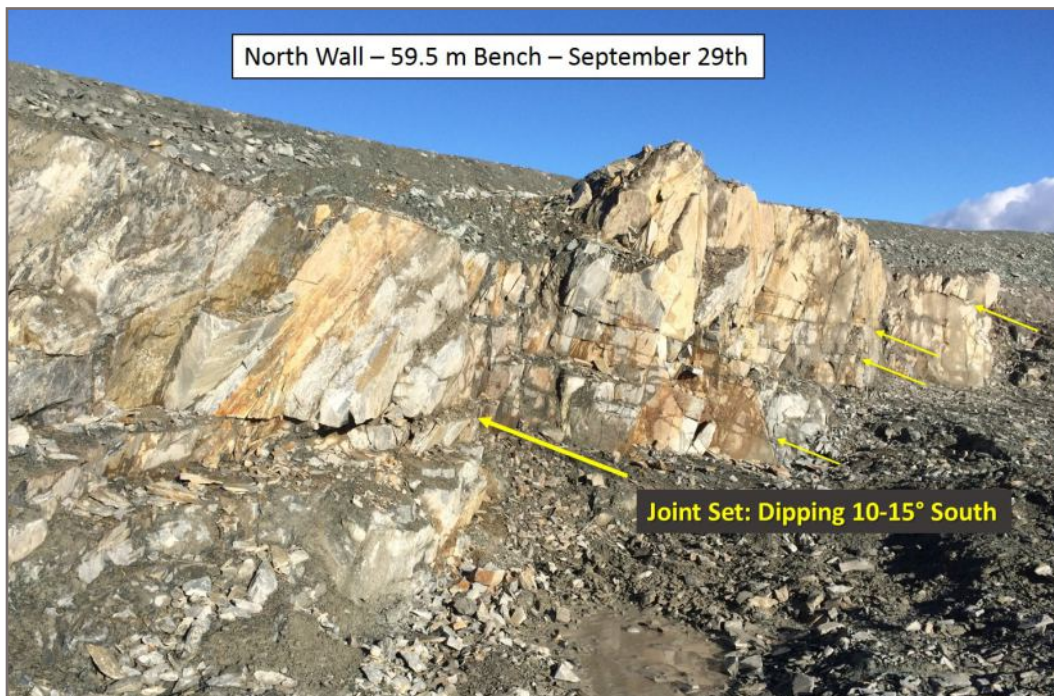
Sub-horizontal jointing associated with water infiltration (looking northeast)
